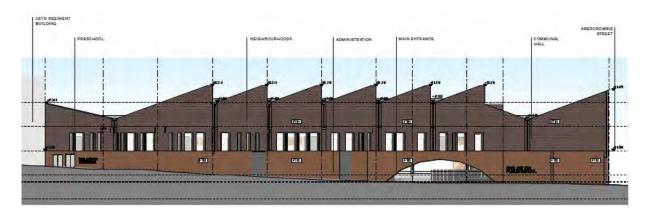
West elevation—Golden Grove Street elevation. (Source: FJMT, April 2020)
